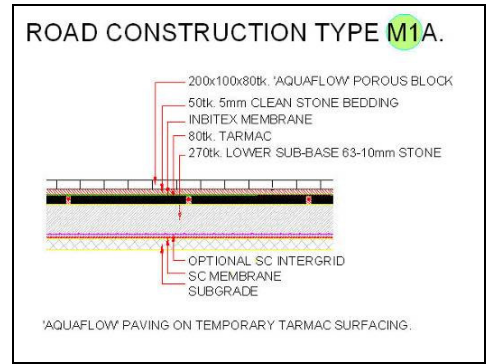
Pervious Paving over temporary construction (Aquaflow)
